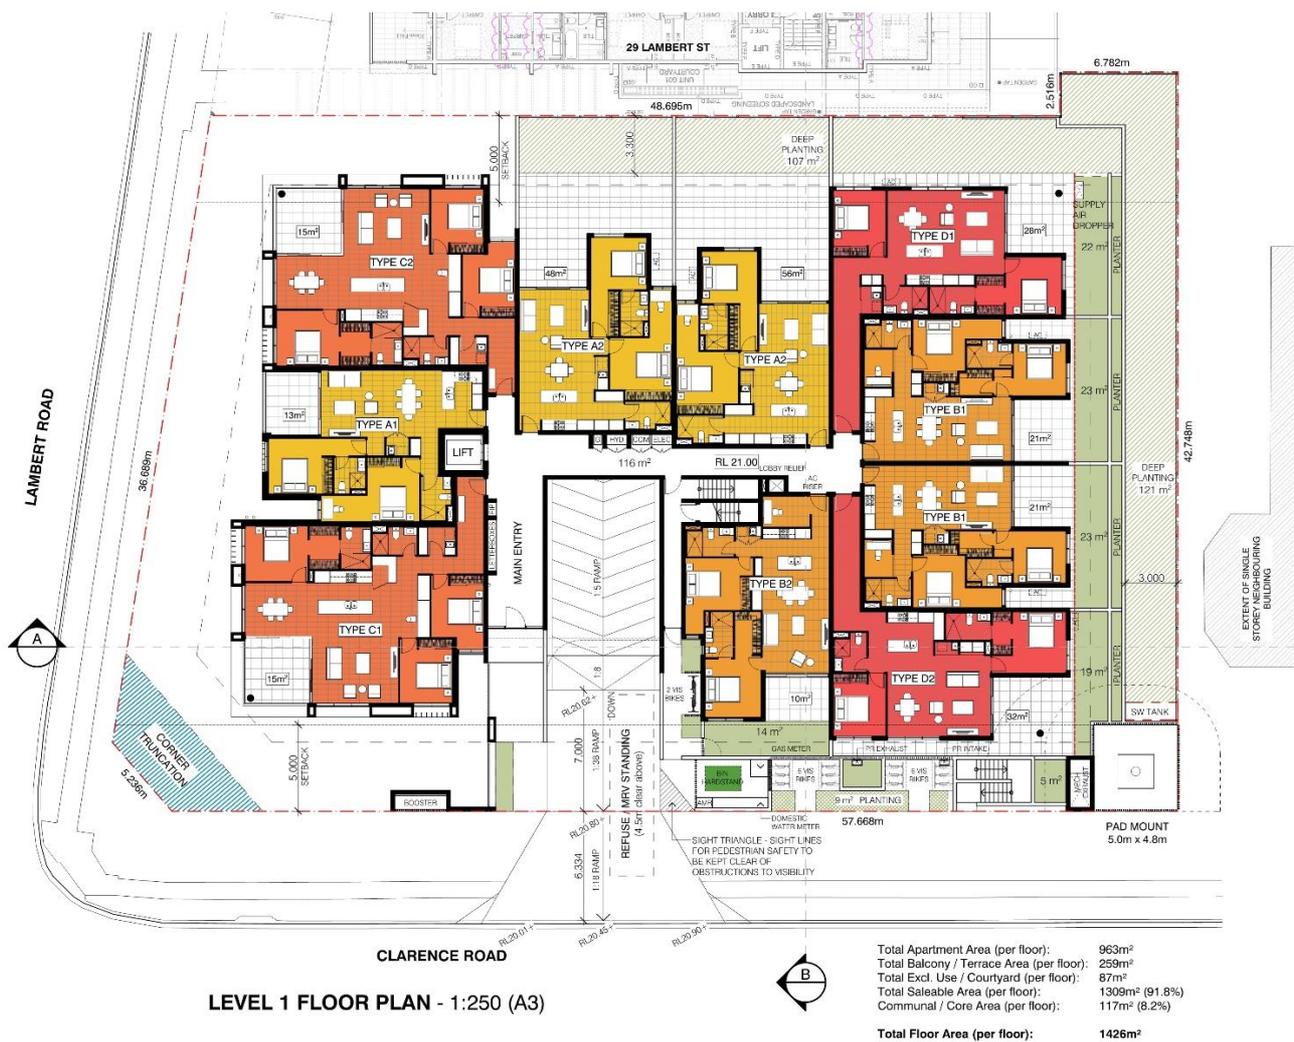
The proposed Ground Level Floor Plan with the boundaries of the amalgamated landholding shown in addition to the building footprint of the most proximate portion of the adjoining heritage place (at image right). Note the proposed location of the vehicular access point into the building’s basement, which is remote from the common boundary with the adjoining heritage place. (Source: bda Architects)
